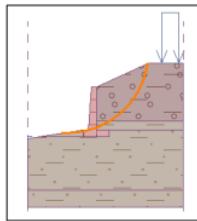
Slope reinforcement modeling results with soil nailing on GEO5 without earthquake loads at STA 444+350/450.
